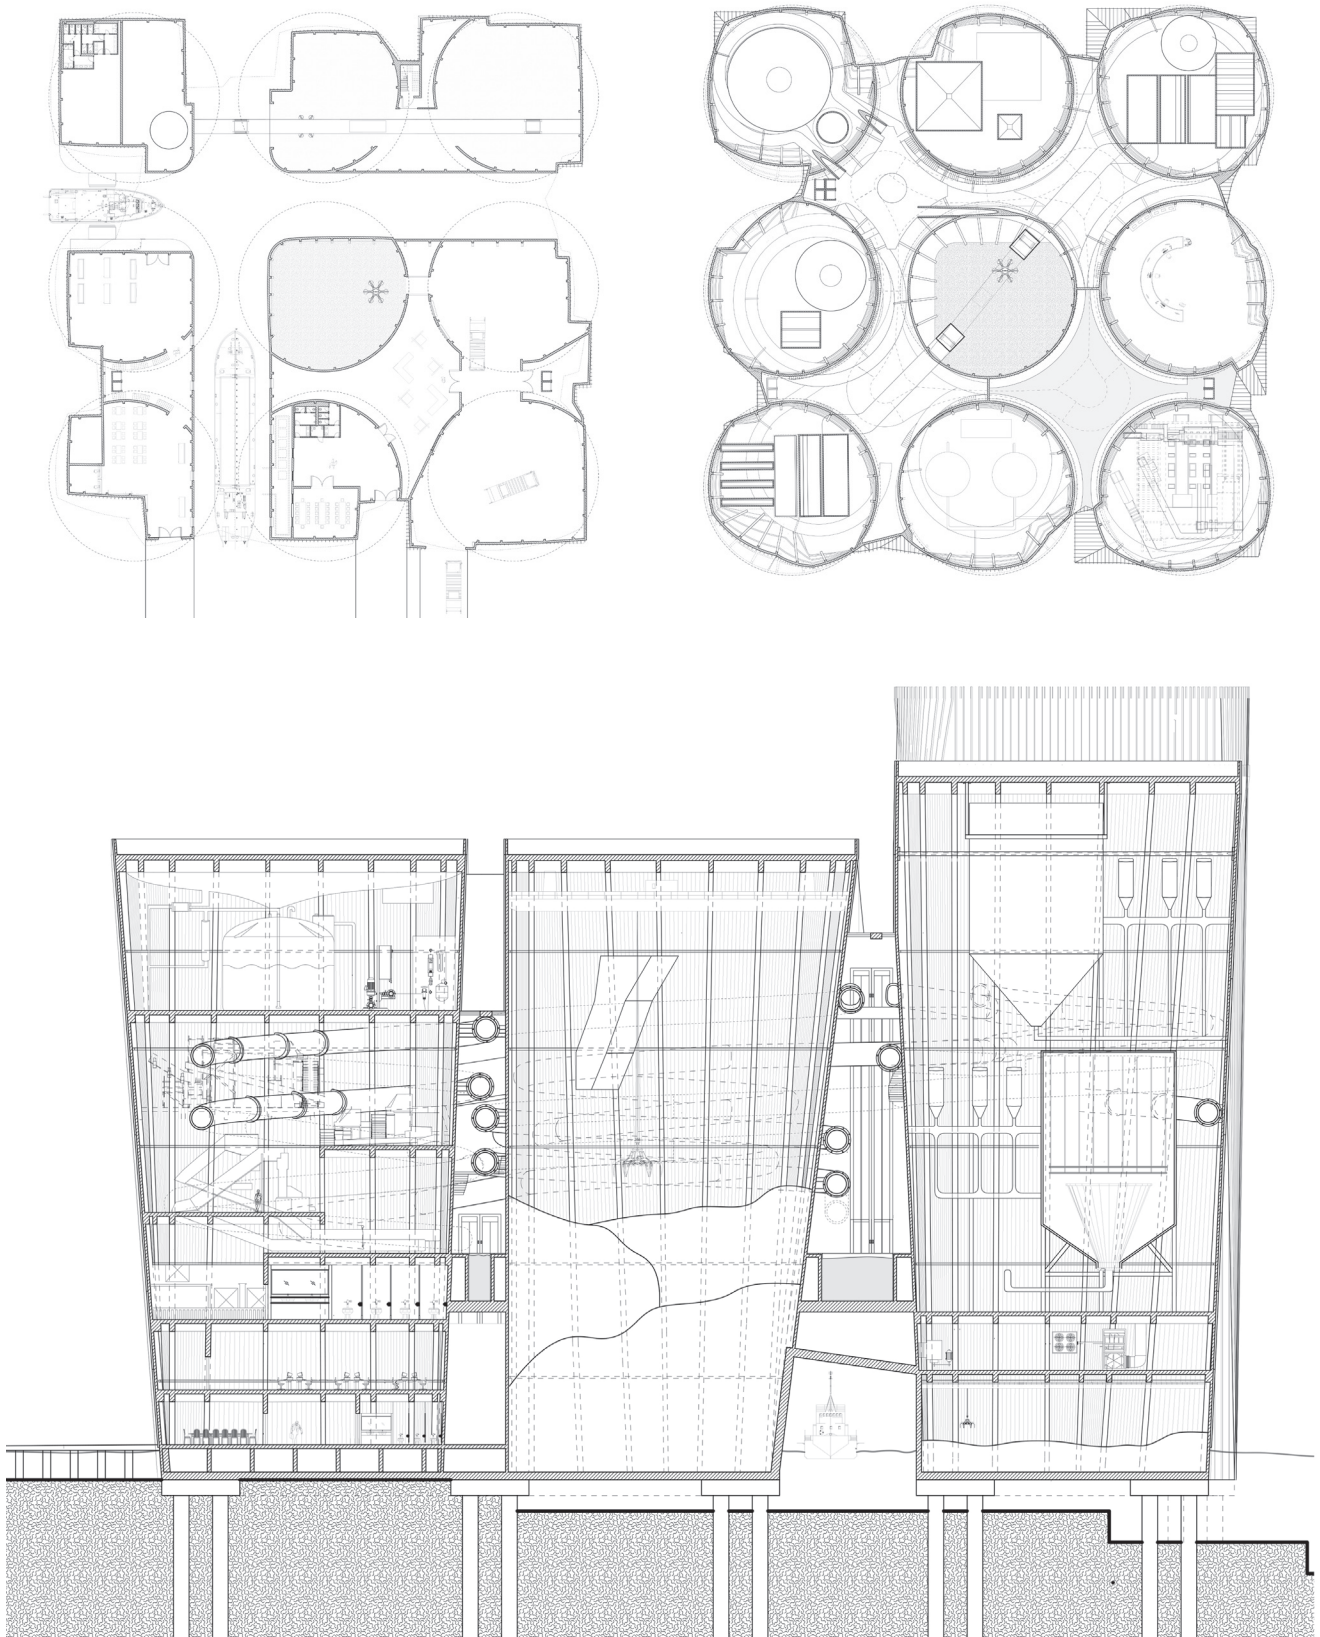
Plans and Section, Manhattan Pier 36. Maria Ugarte and Sirinya Wutthilaohaphan.
